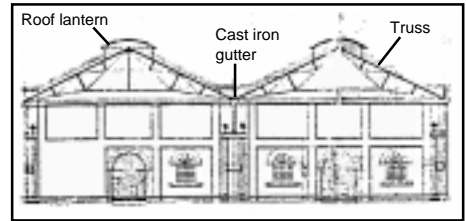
Section showing the roof system, Source: SRAO ELW3.
